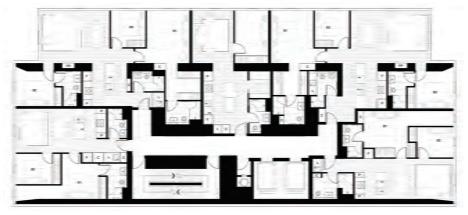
Plan (Source: Bates Smart) 图8. 平面图(来源: 贝茨玛)
